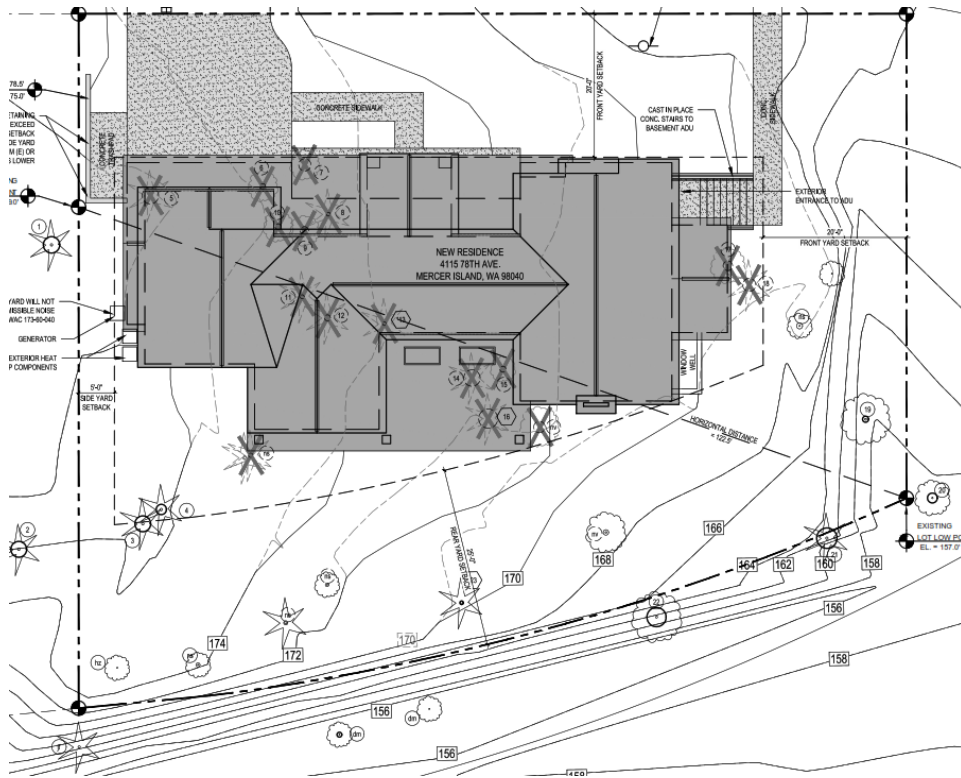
Excerpt from the site plan showing the layout of the proposed home.
